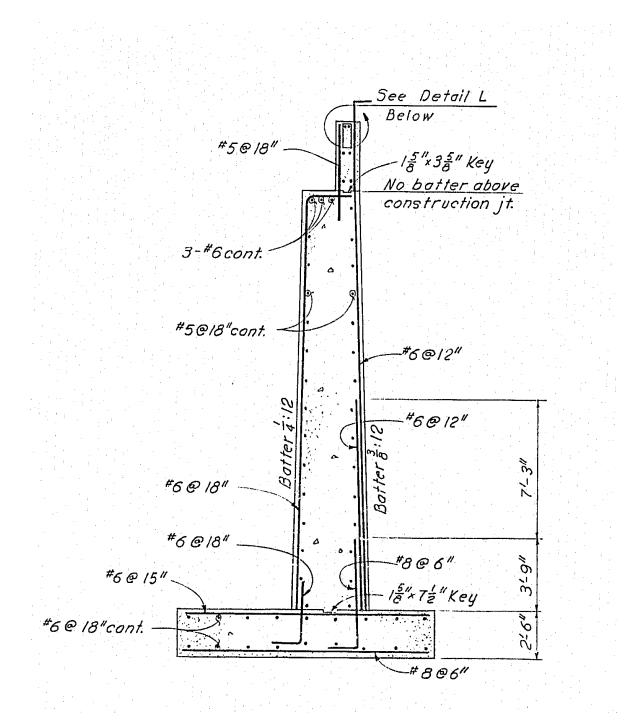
Abutments 1, 2 and 3 to spread footings connection, inadequate reinforcing embedment length
